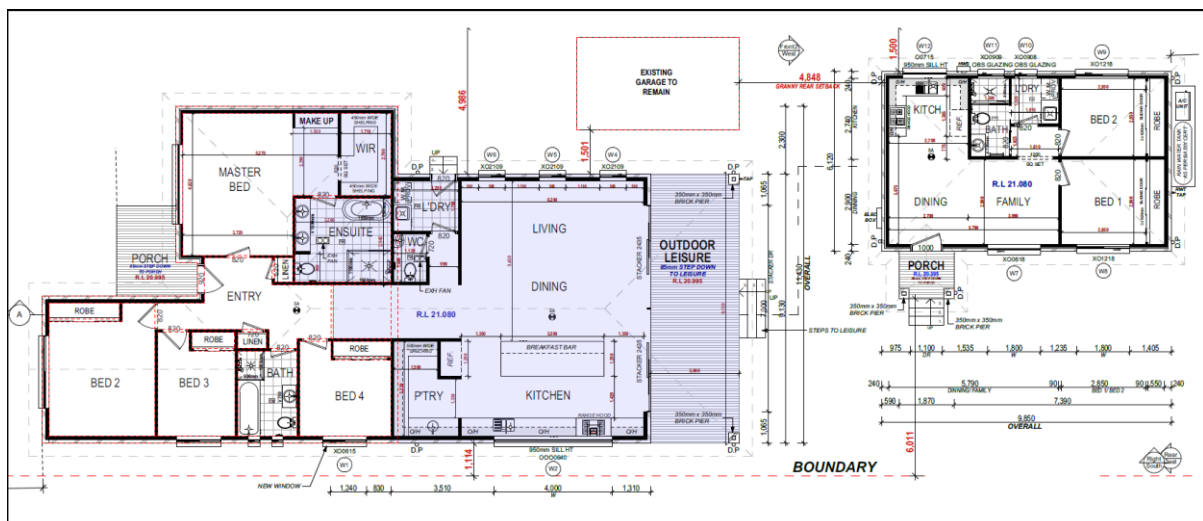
Proposed ground floor plan(s) - principal dwelling (left); secondary dwelling (right)
